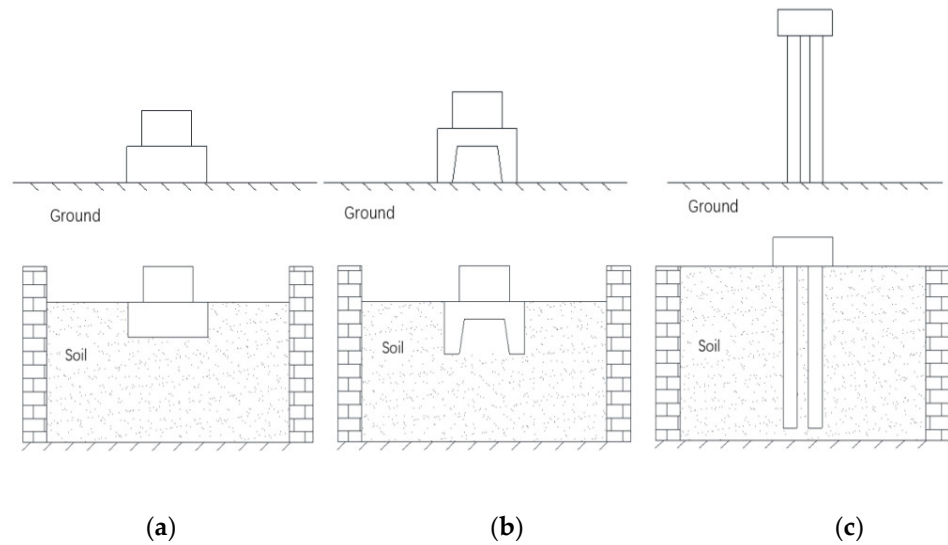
Foundation models located on the ground and fully buried in the soil: (a) spread foundation; (b) caisson foundation; (c) grouped pile foundation.
